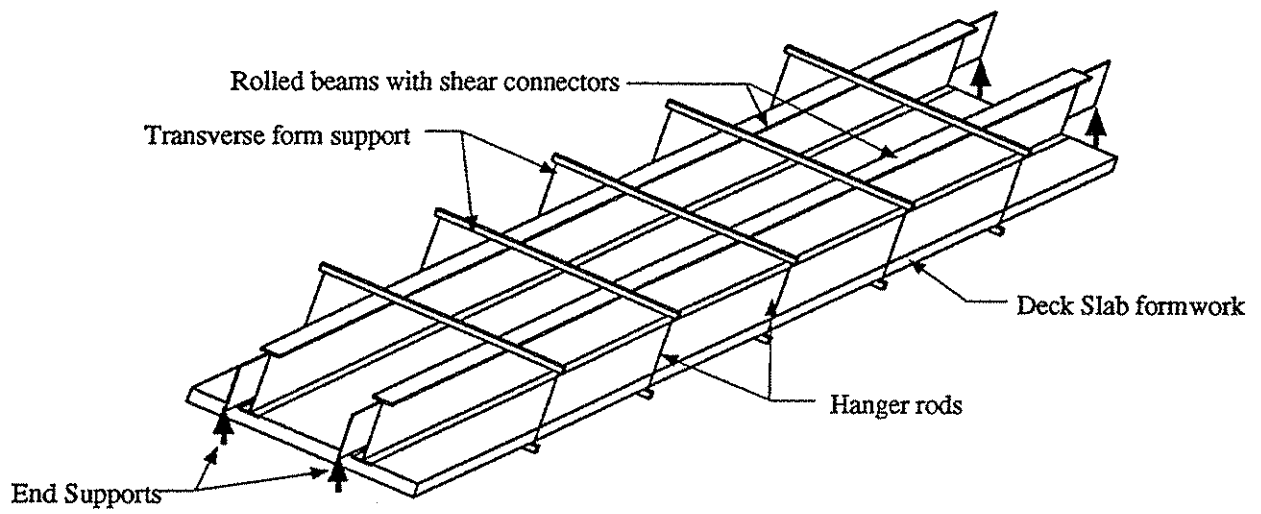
Formwork and support system for fabrication of the Inverset units.
